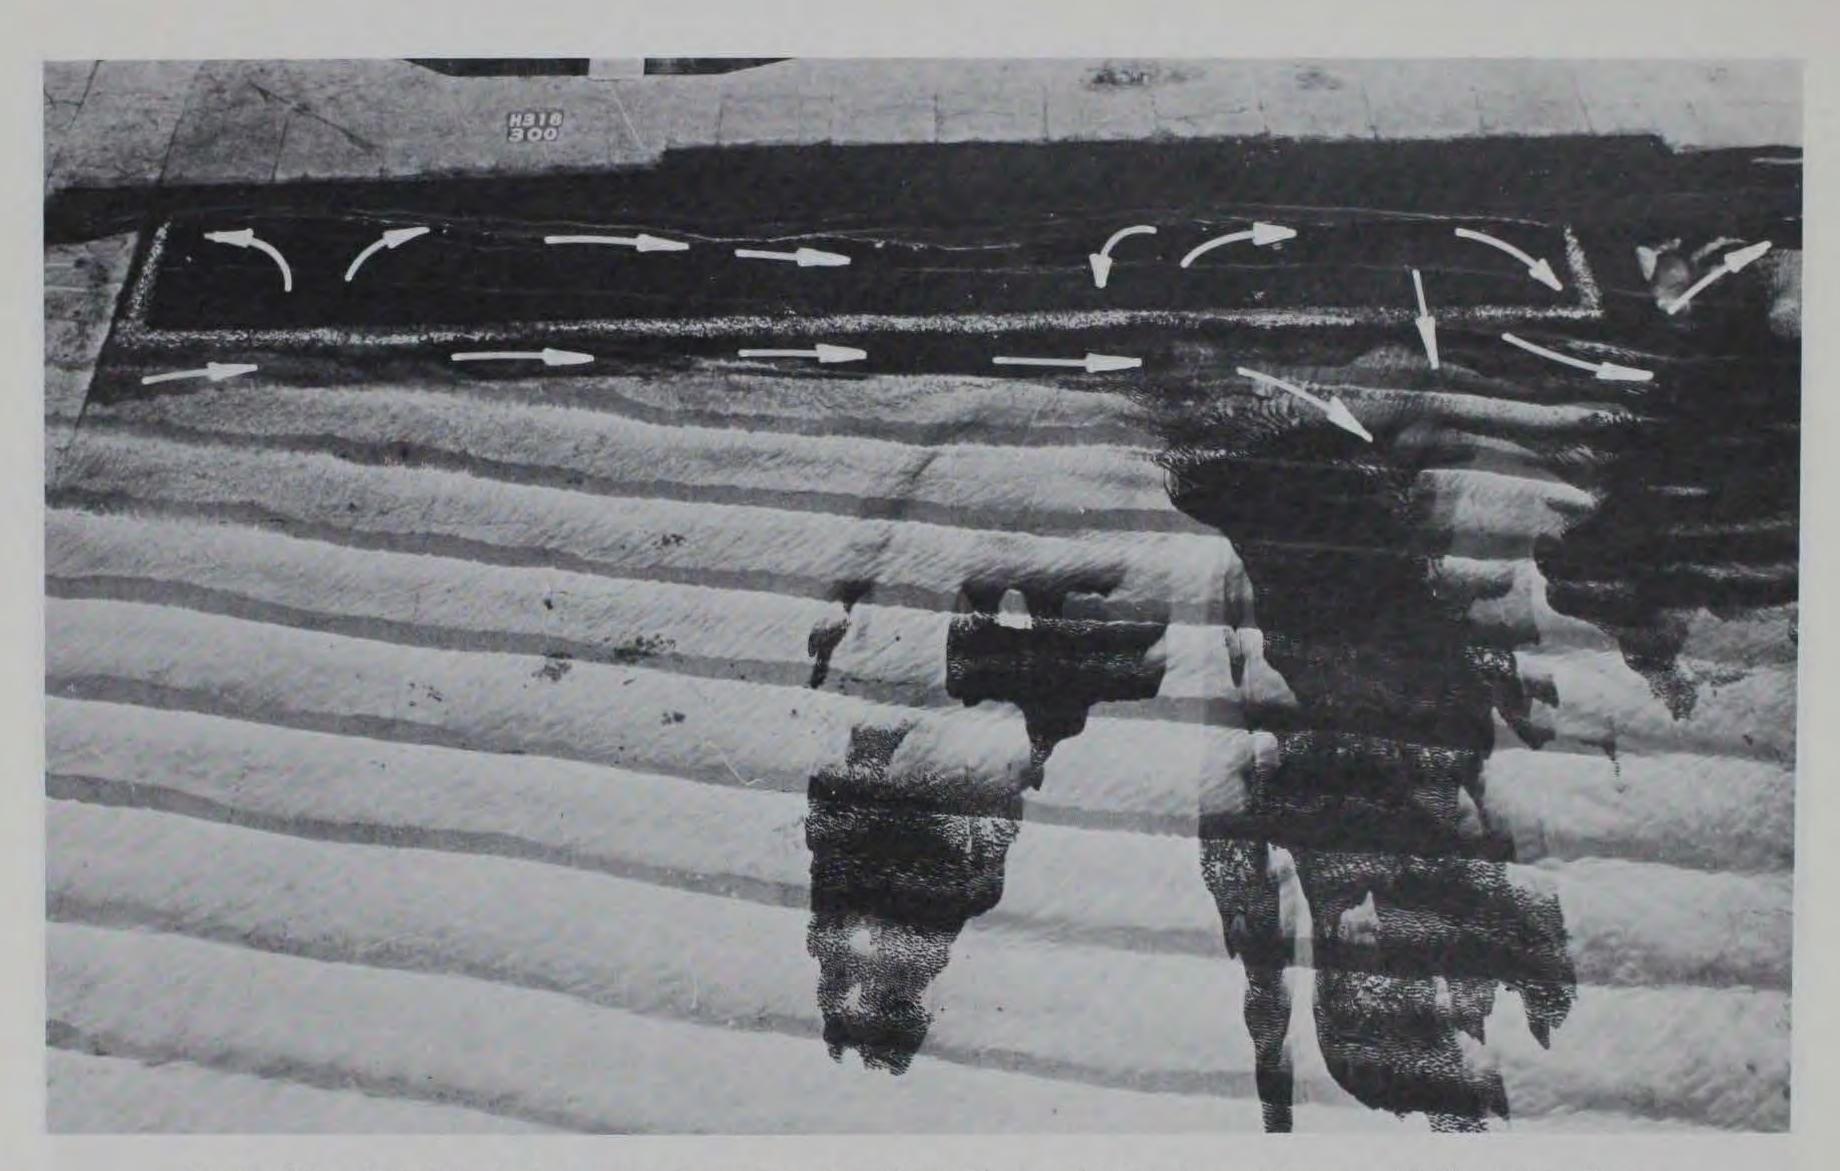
Movable-bed tracer deposits for Plan 14 resulting from 11-sec, 10-ft waves from west at mllw (extended test wave duration)
